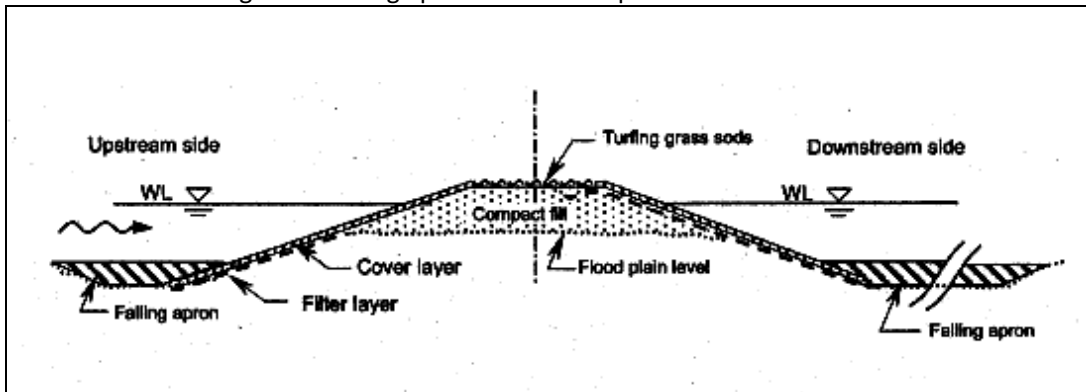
Typical cross-section of an impermeable groyne (non-submerged).
